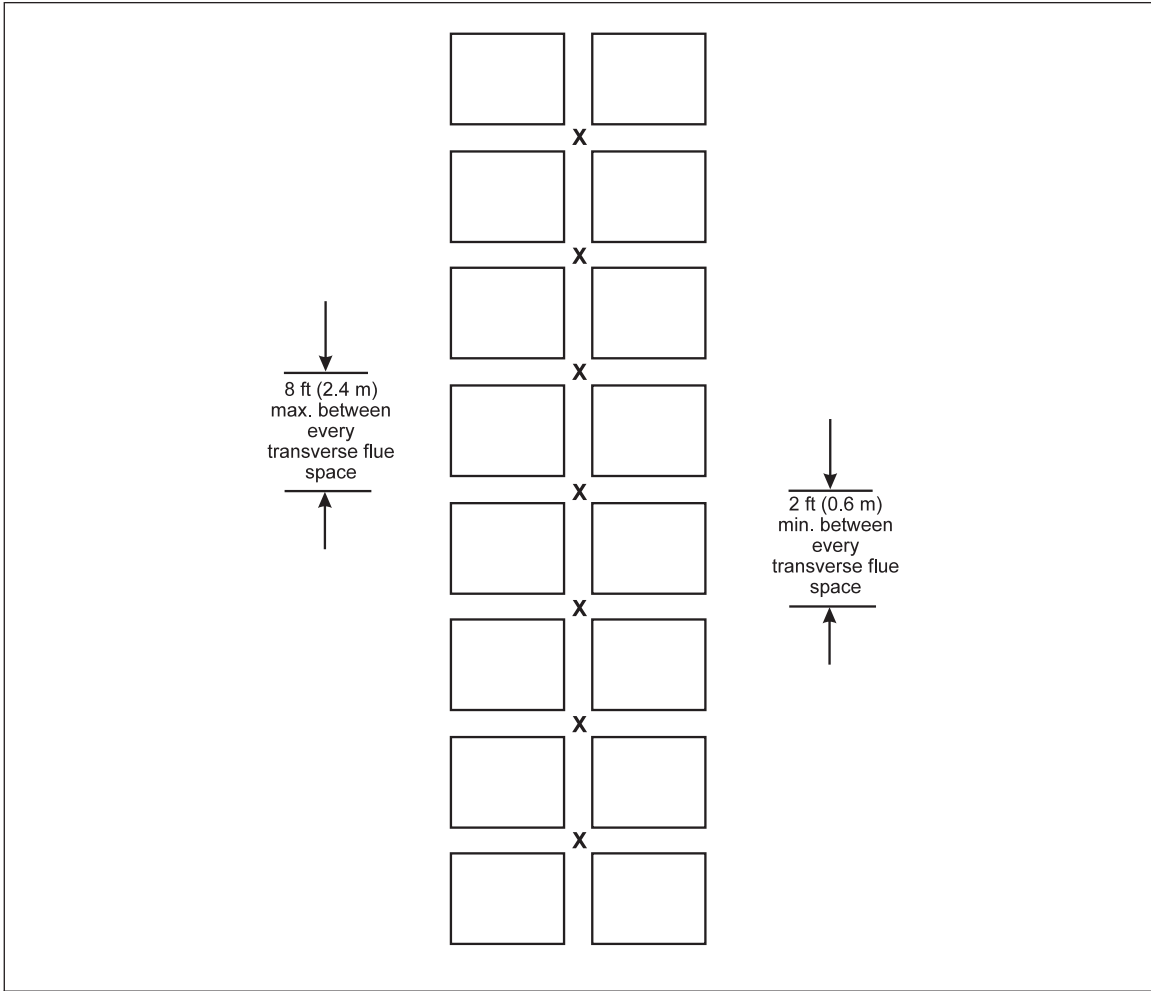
Plan view of IRAS(E) in-rack sprinkler arrangement in longitudinal flue only for double-row racks
